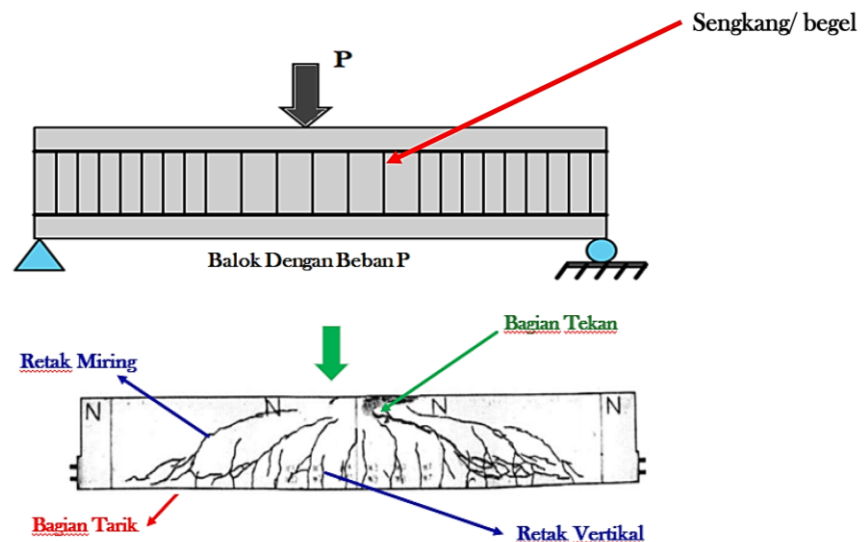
Cracking Mechanism on Reinforced Concrete Blocks (Sudarno, 2022)
